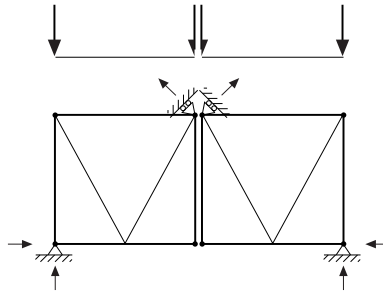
Support of the apex (additional support to shorten the span of the bracing).
